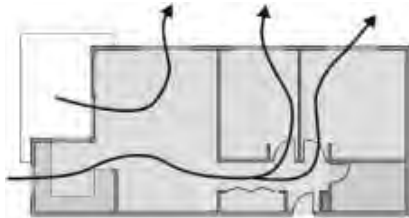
effective layout for an upper level corner dwelling/apartment.
